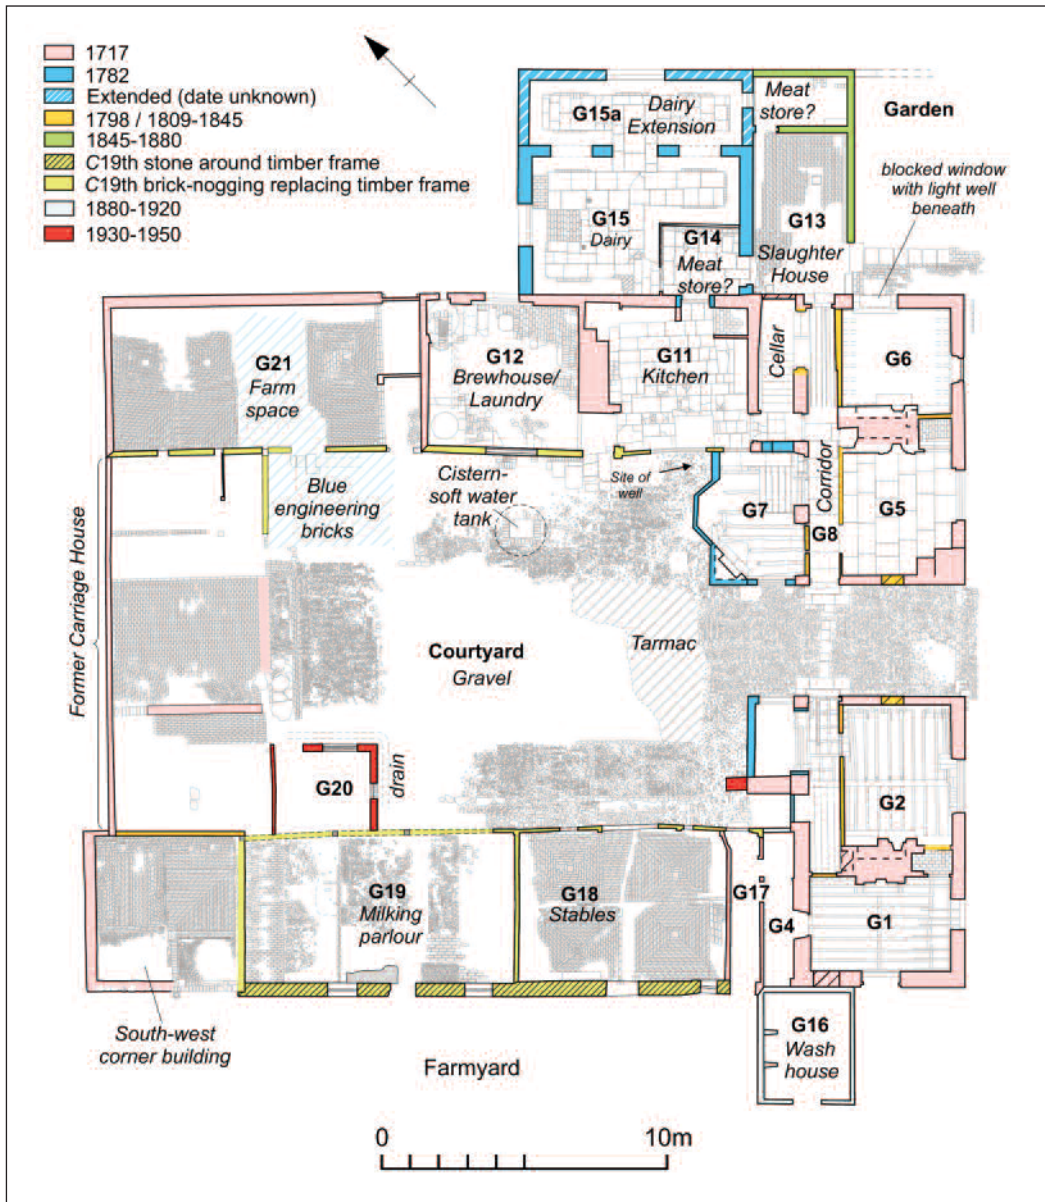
Plan of the main courtyard and ground floor rooms colour coded to show phasing
